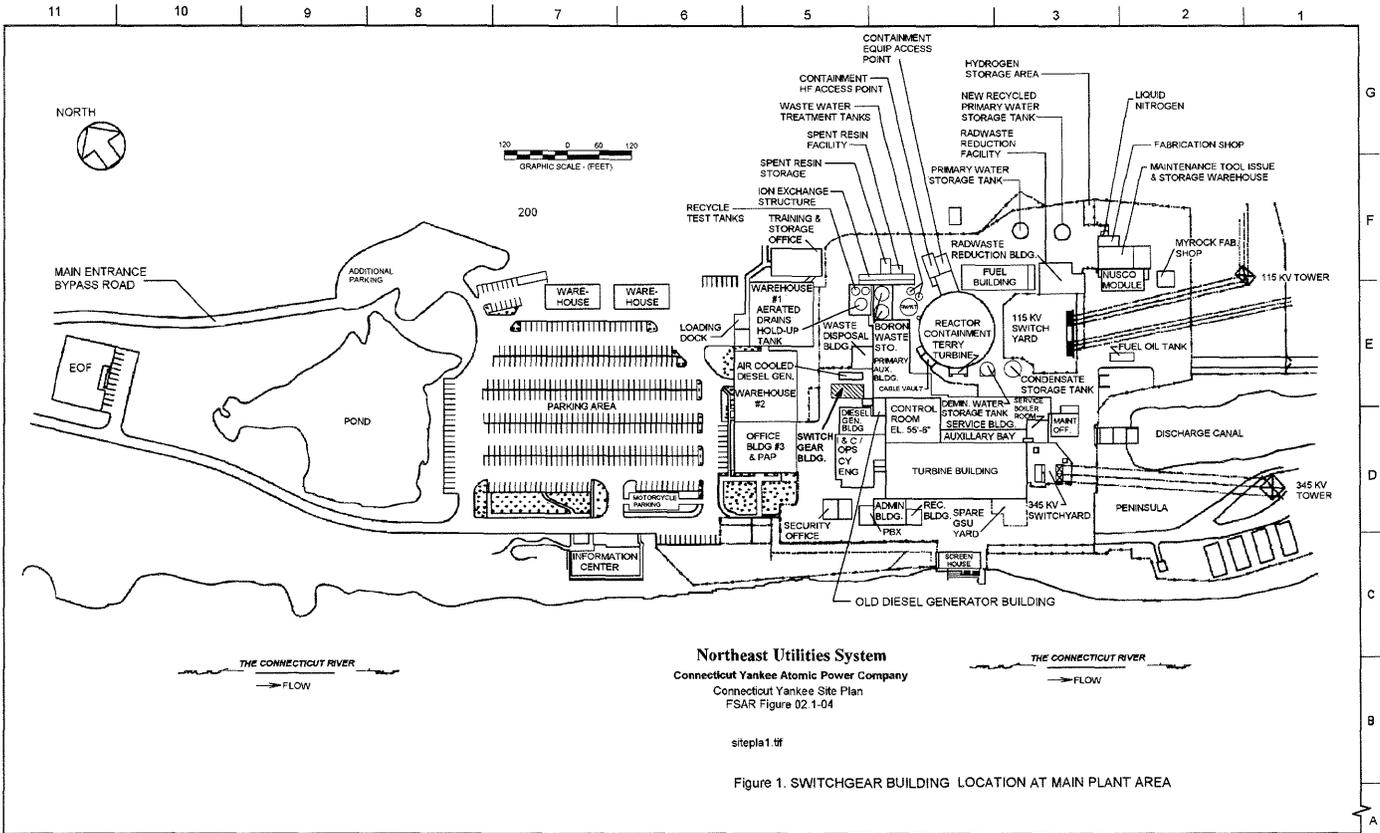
LOCATION OF SWITCHGEAR BUILDING
